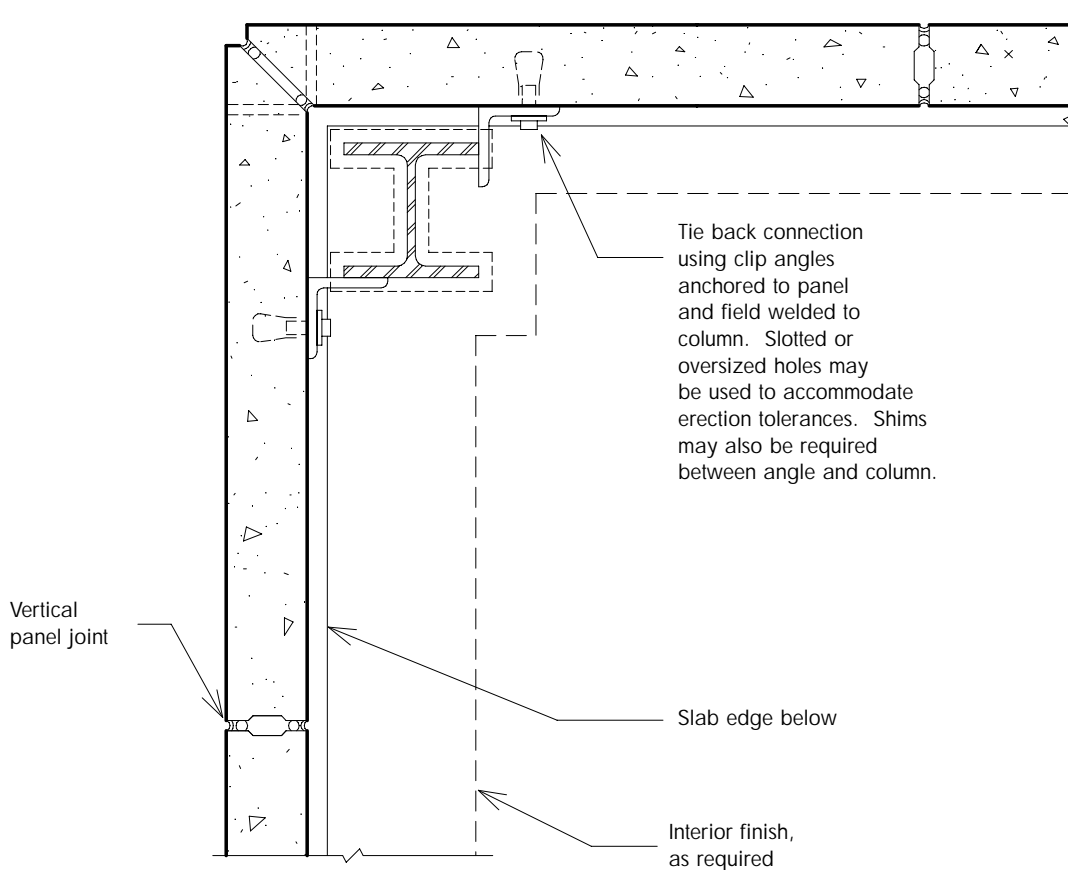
Detailing Considerations for Precast Concrete Panels (Sample Wall Section Detail at Vertical Span Precast Panels)
